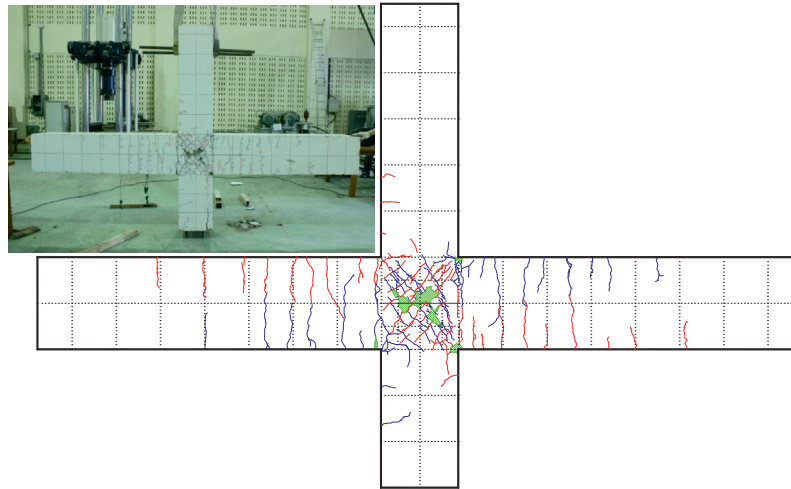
Crack Patterns at Failure of RC-control specimen.
